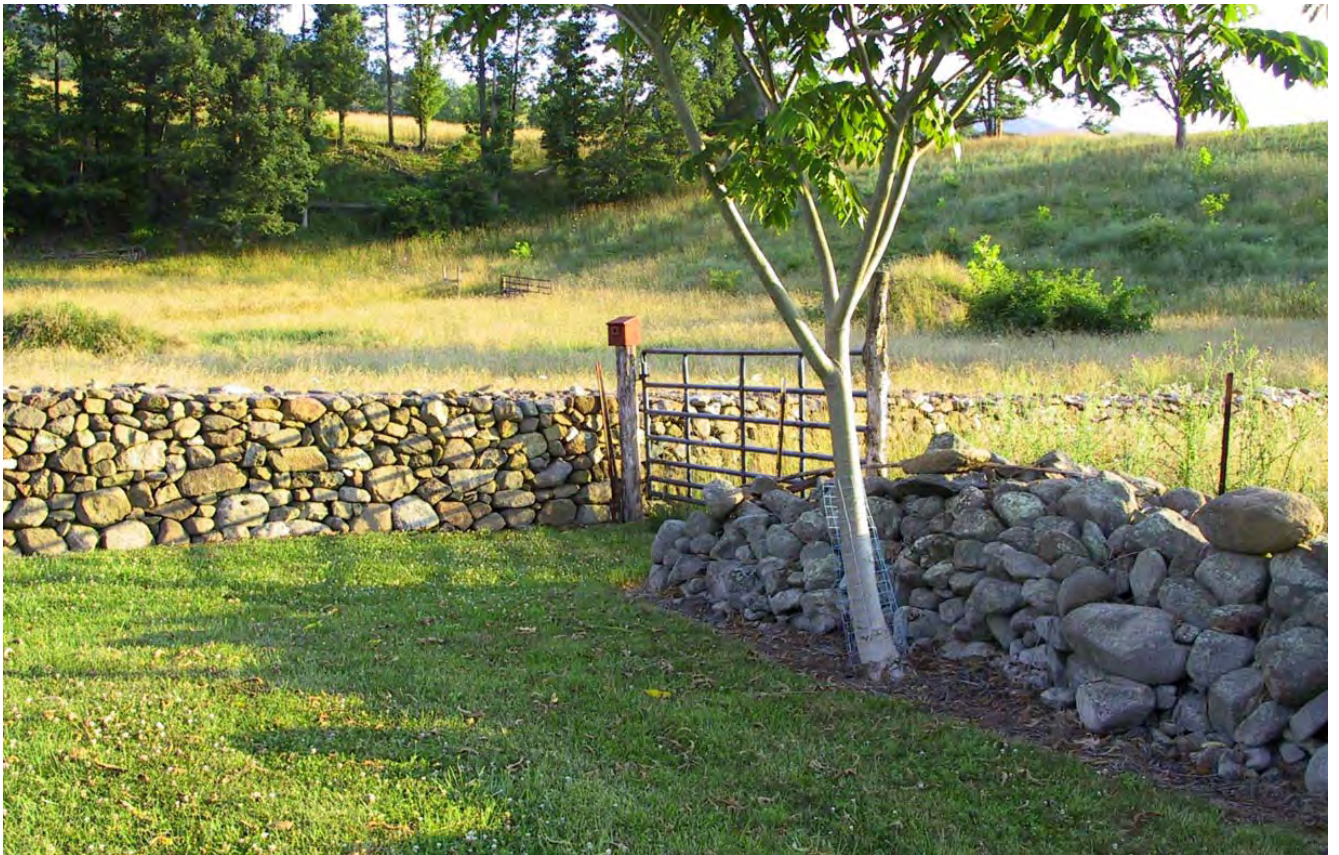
Top of wall rebuilt by Clem brothers showing rubble infill.
